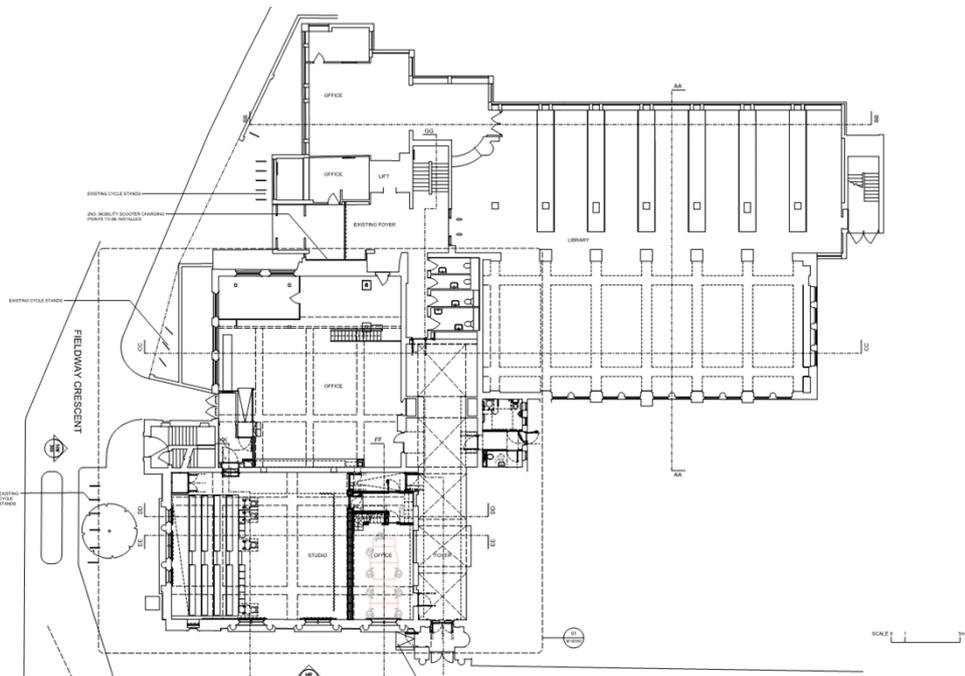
Proposed Rehearsal Studio (Ground floor plan) in context of wider Library
